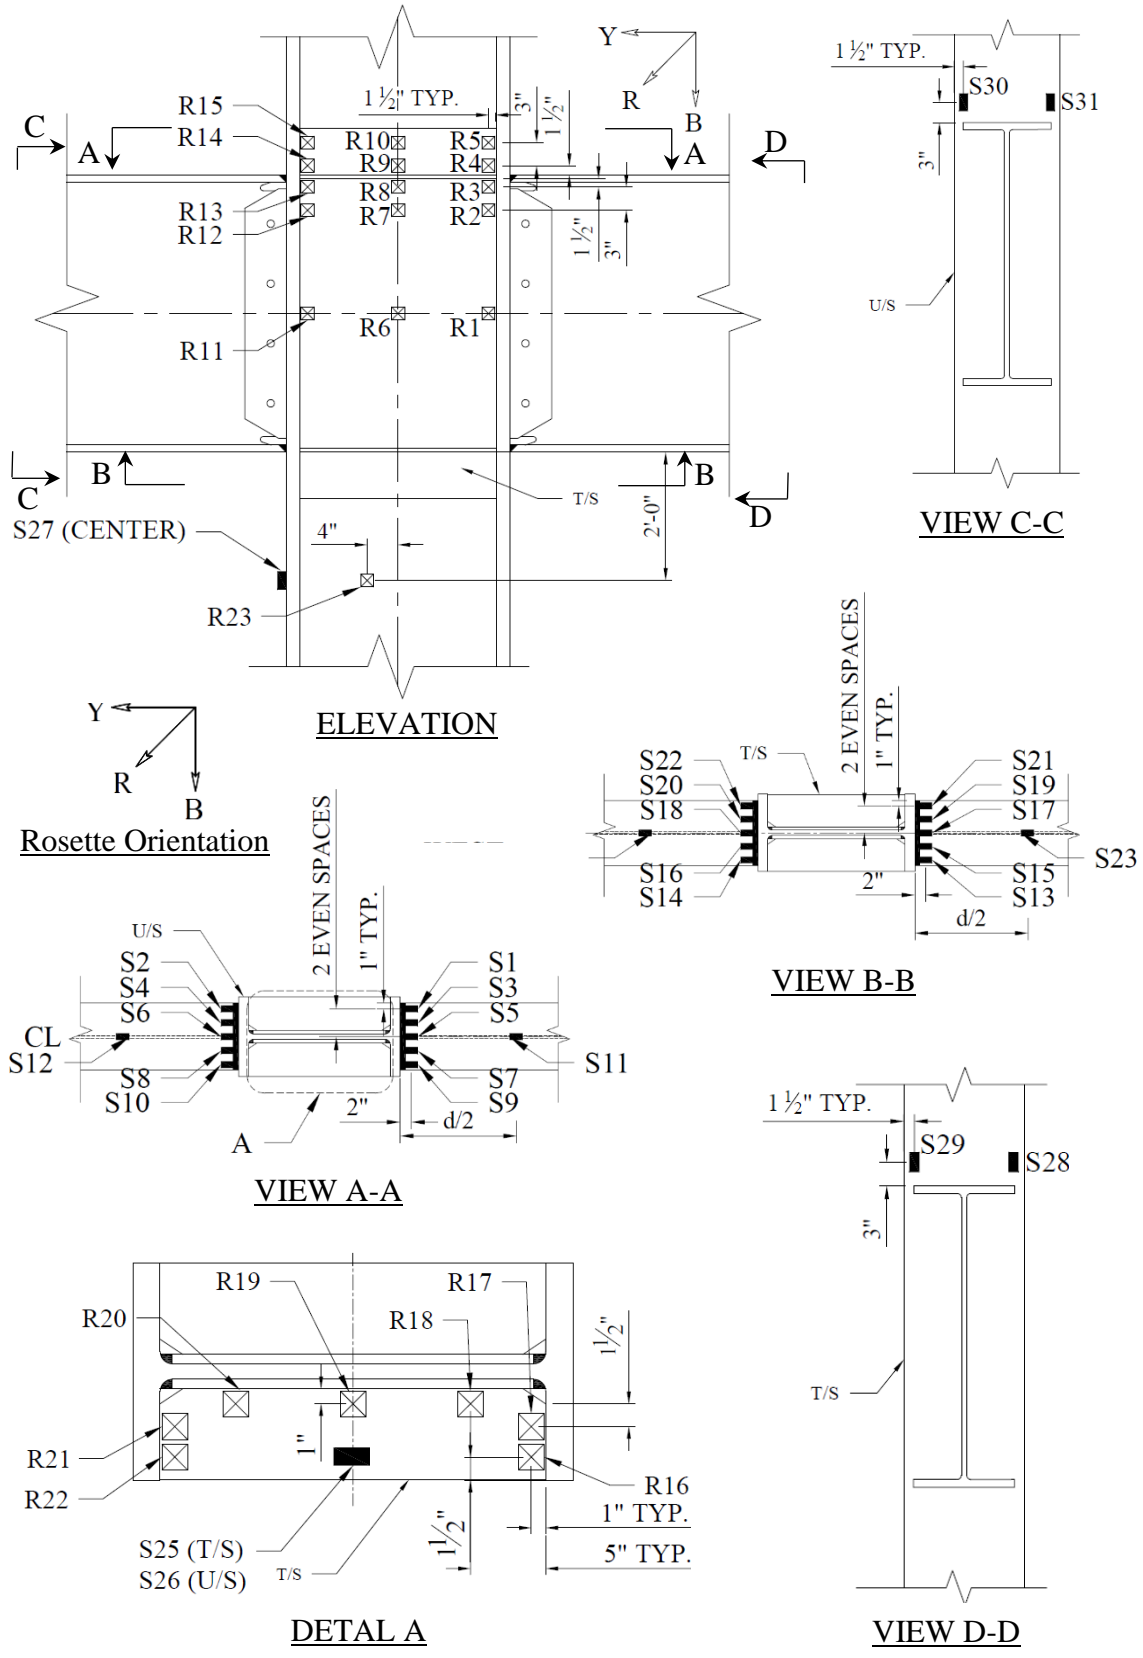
Interior Frame (Specimen W1 to W4): Instrumentation
